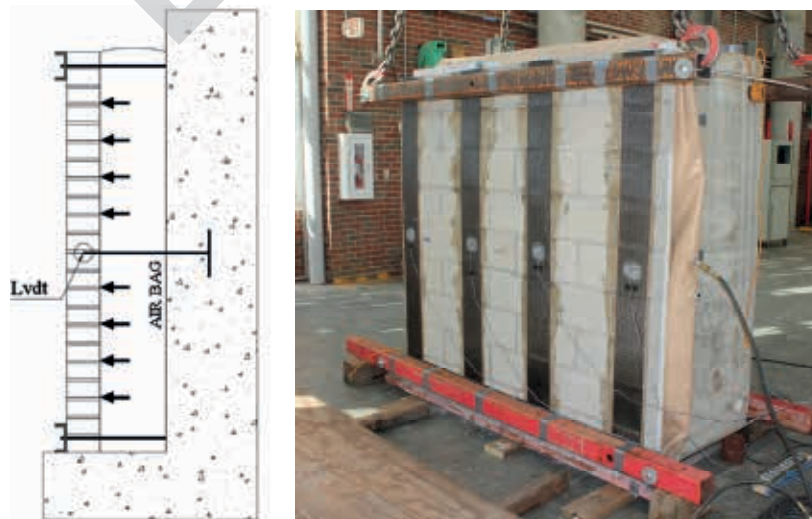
RCF flexural CMU wall test setup, schematic (left) and laboratory view (right)
